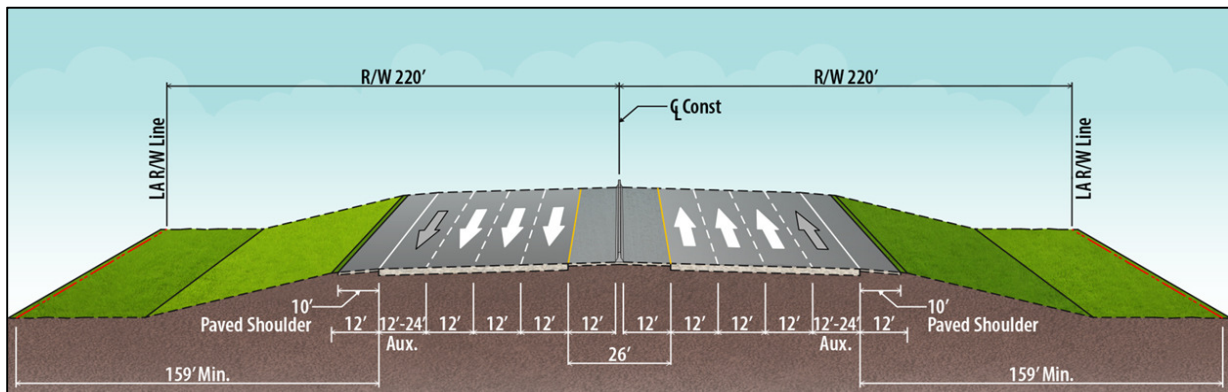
Existing I-275 Mainline Typical Section from south of 9th Street North to south of 4th Street North (Segment C-3)
